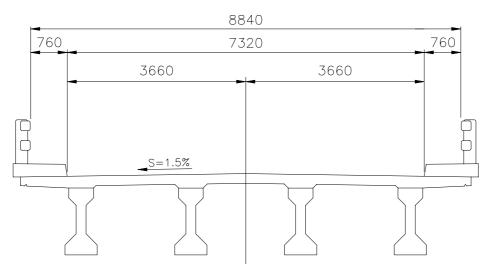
BRIDGE WIDTH
